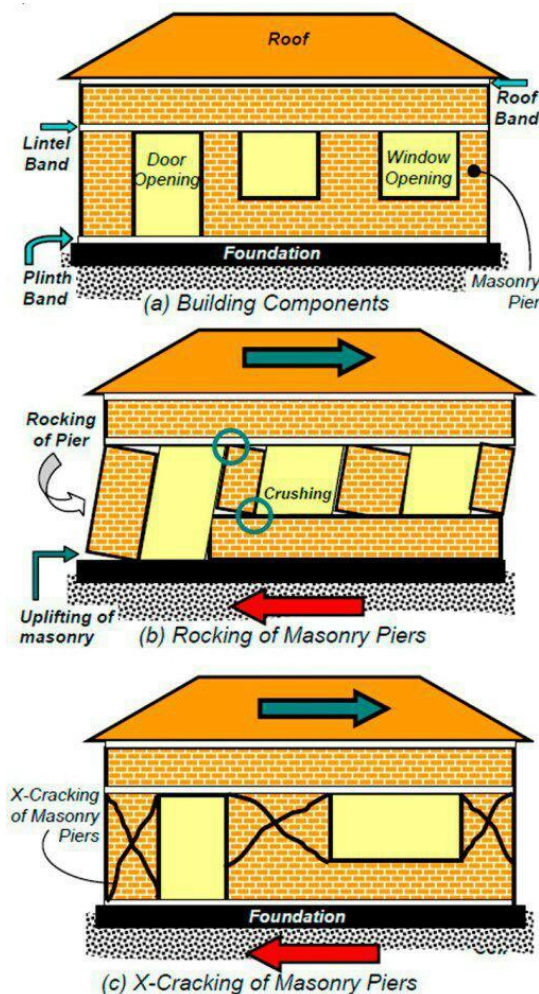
Earthquake response of a hipped roof masonry building – no vertical reinforcement is provided in walls.
